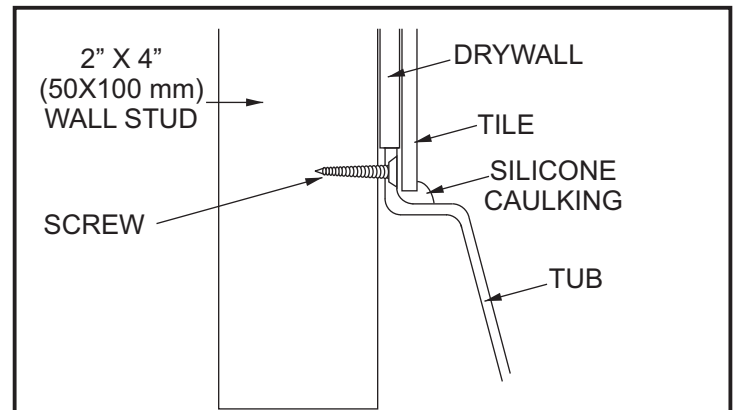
WALL INSTALLATION FOR TUBS WITH TILE FLANGE
